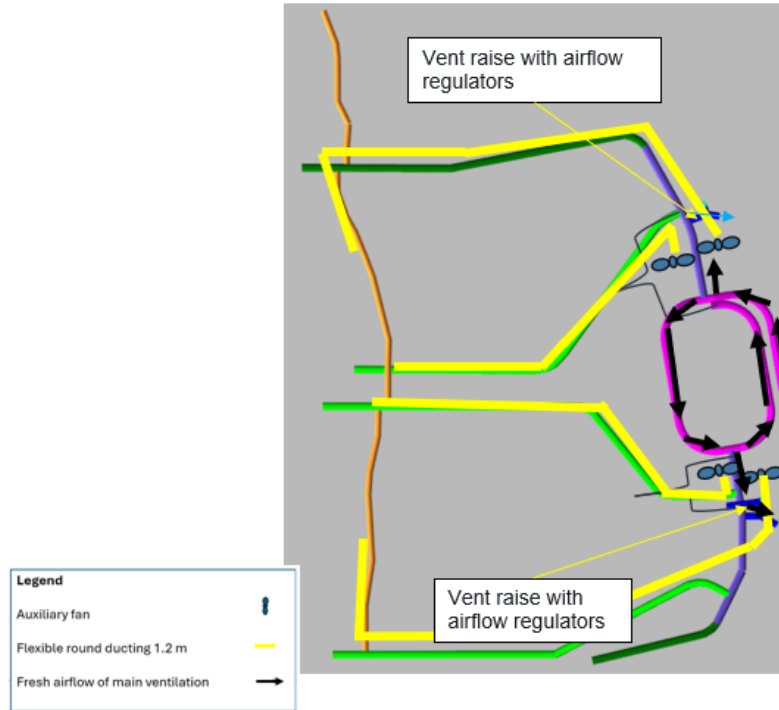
Ramp Development Following Internal Ventilation Raise Connection
